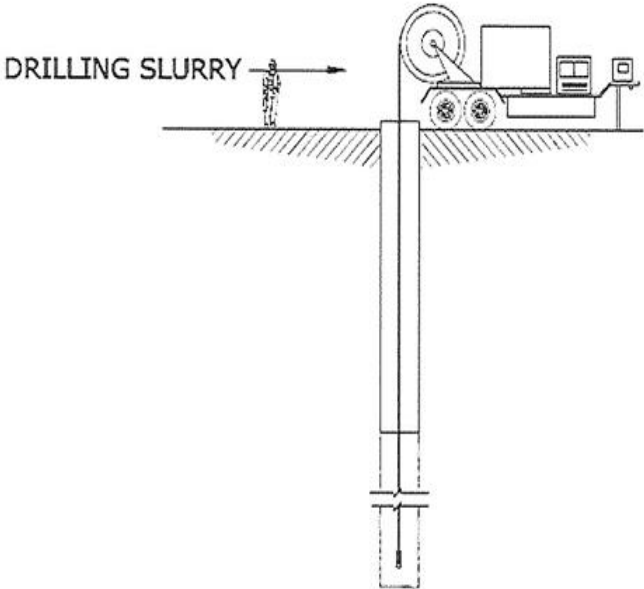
Desanding of The Pile (If used Bentonite Slurry)
